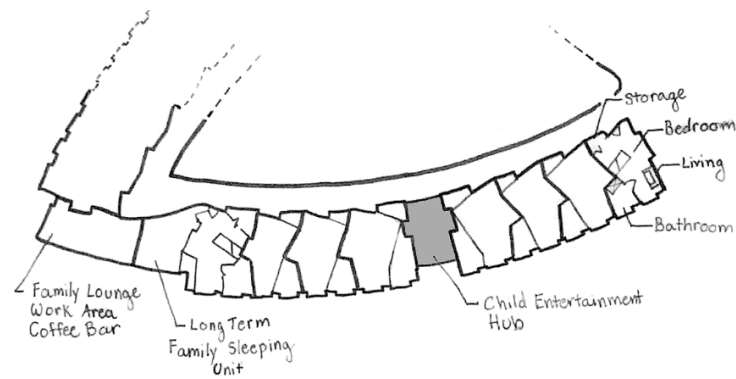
Moseley Institute Foundation newer plan. Drawing by HDR Architects.
